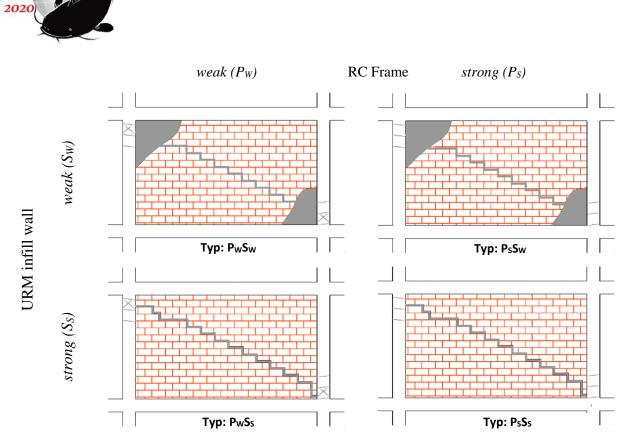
Typical schematized damage patterns for reinforced concrete frames with masonry infill walls depending on material quality, relative strength and stiffness [16].
